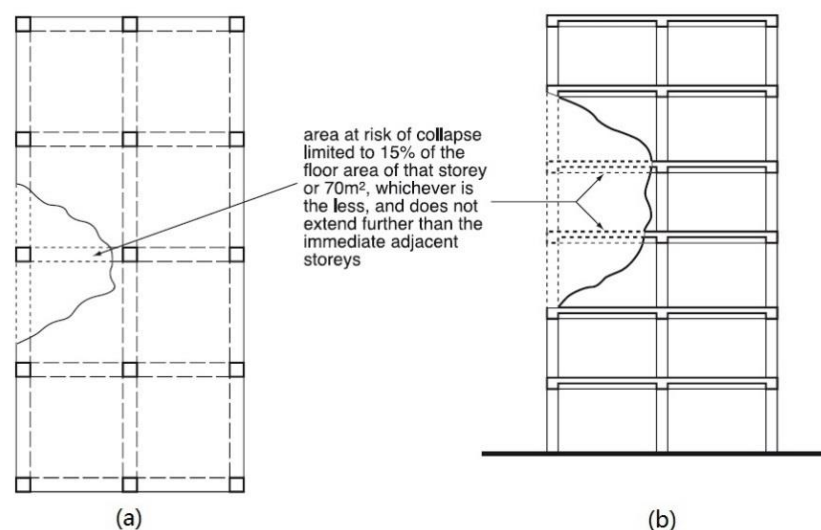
Recommended limit of the admissible damage a) Plan b) Section (Minister 2004)
